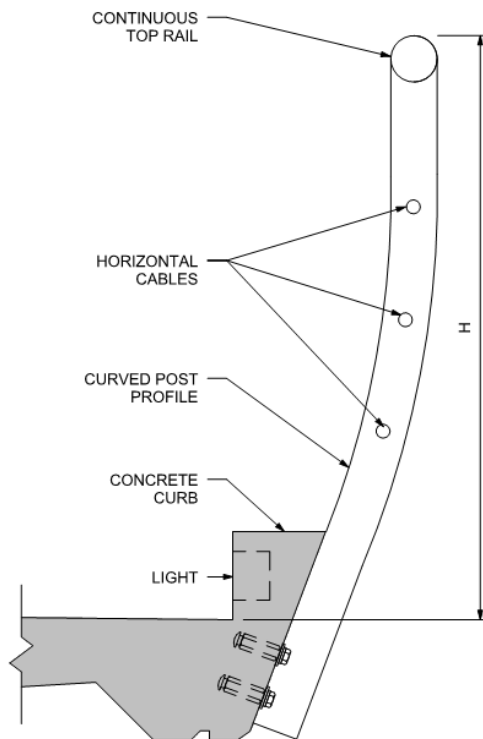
Elevated Guideway OH&S Protection Railing
